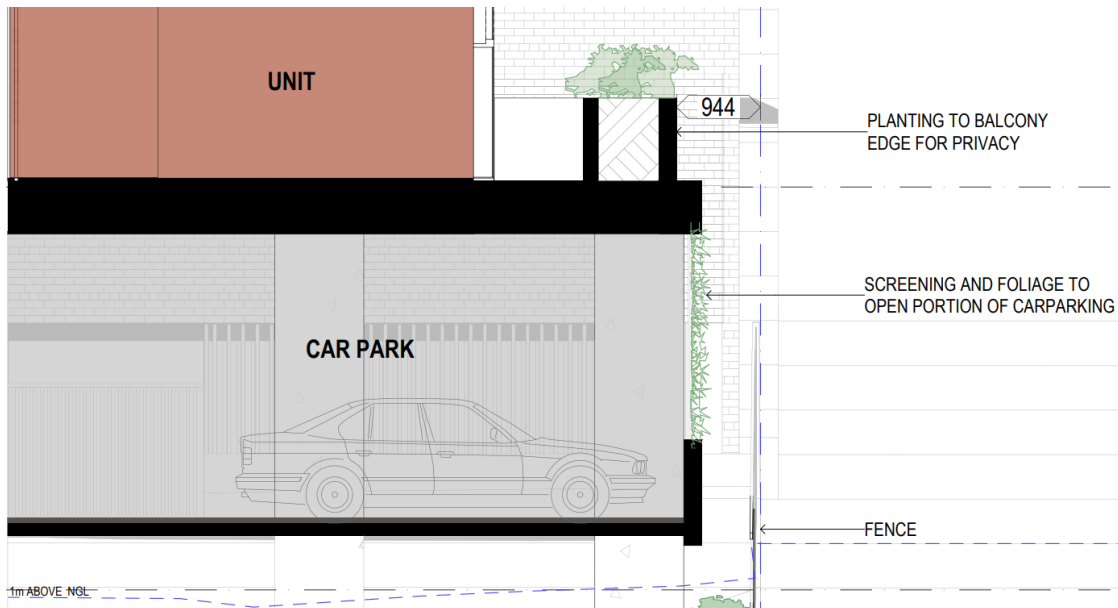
Proposed screening elements to ground level car parking - O'Connell Street Tower
